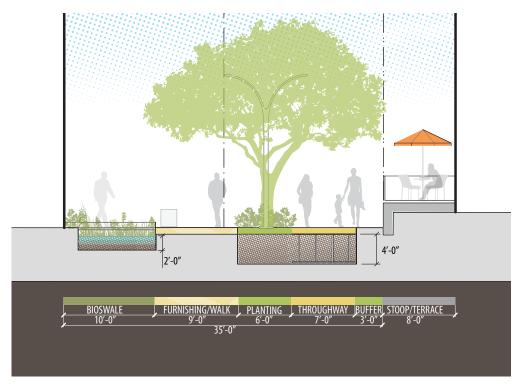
COVE LANEWAY SECTION-TYPICAL
